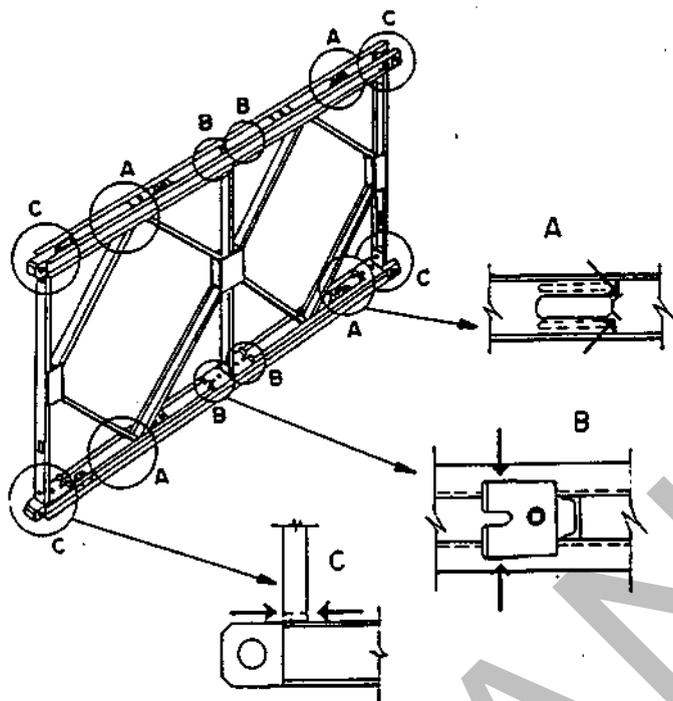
Bailey Bridge Truss Showing Common Locations of Cracking
